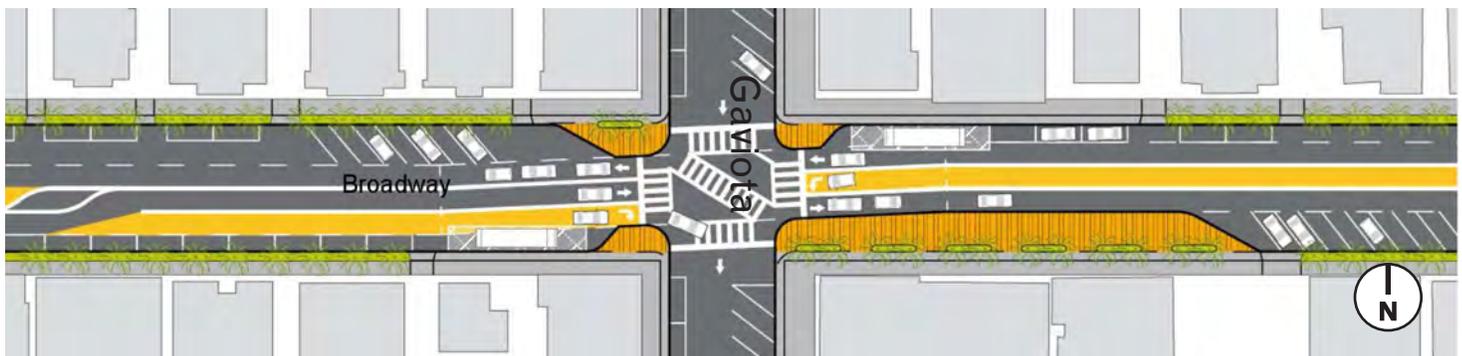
Broadway at Gaviota Intersection: Proposed (90 parking spaces)
